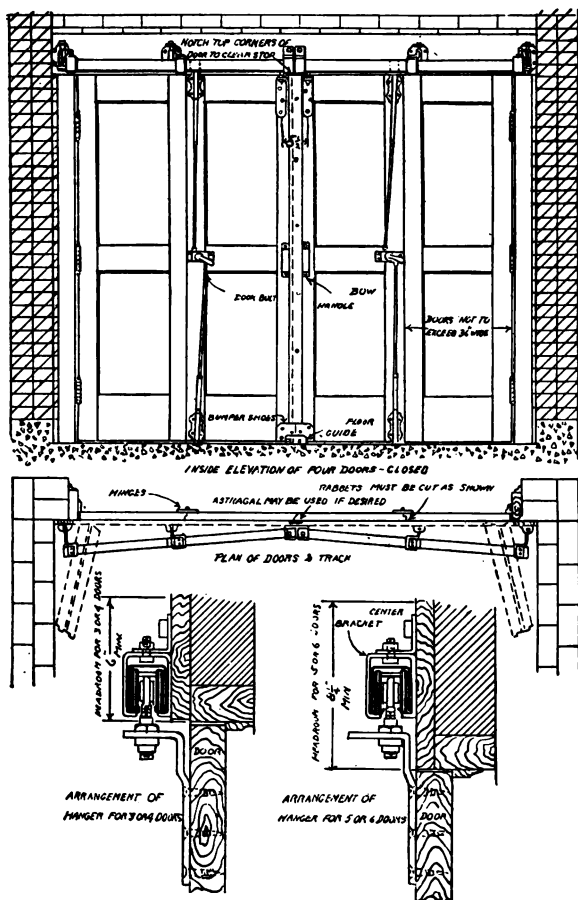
INSIDE ELEVATION OF FOUR DOORS WITH DETAILS OF HANGER ARRANGEMENT
